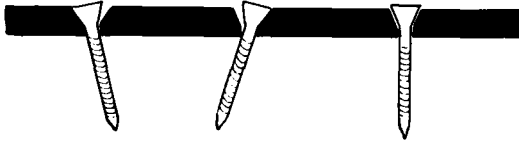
Minute gaps are often formed between screw head and plate or flange.
